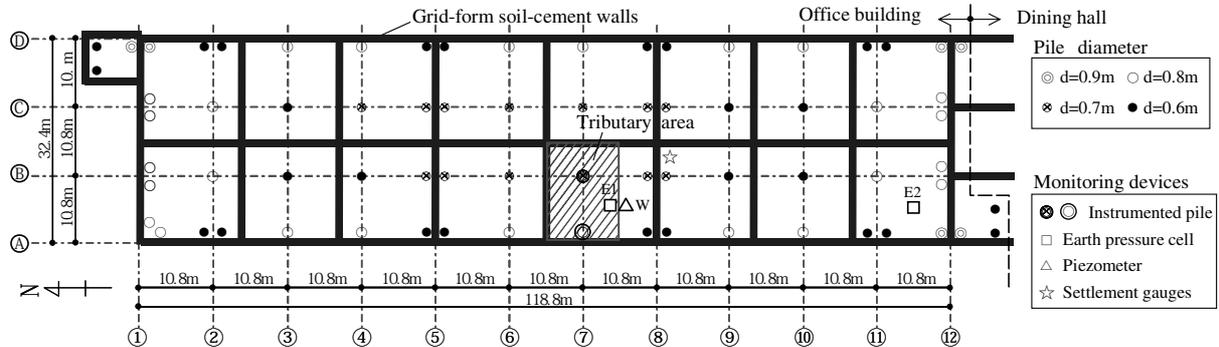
Layout of piles and grid-form soil-cement walls with locations of monitoring devices.
